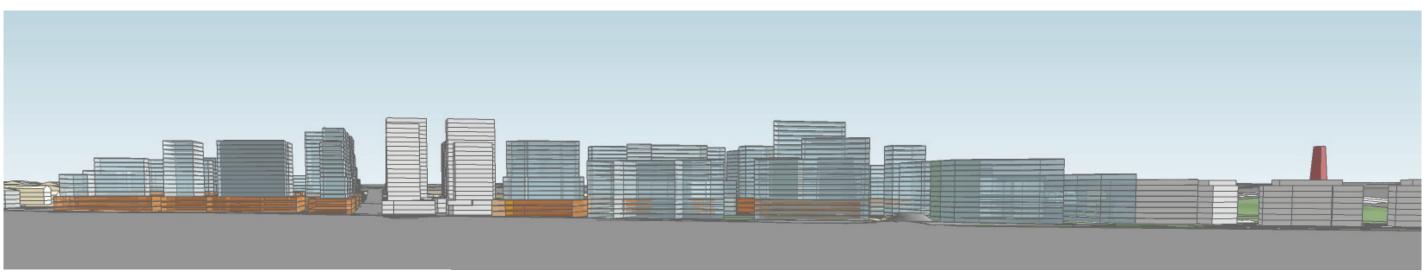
Proposed Built Form Model - Looking West from the Railway Corridor
